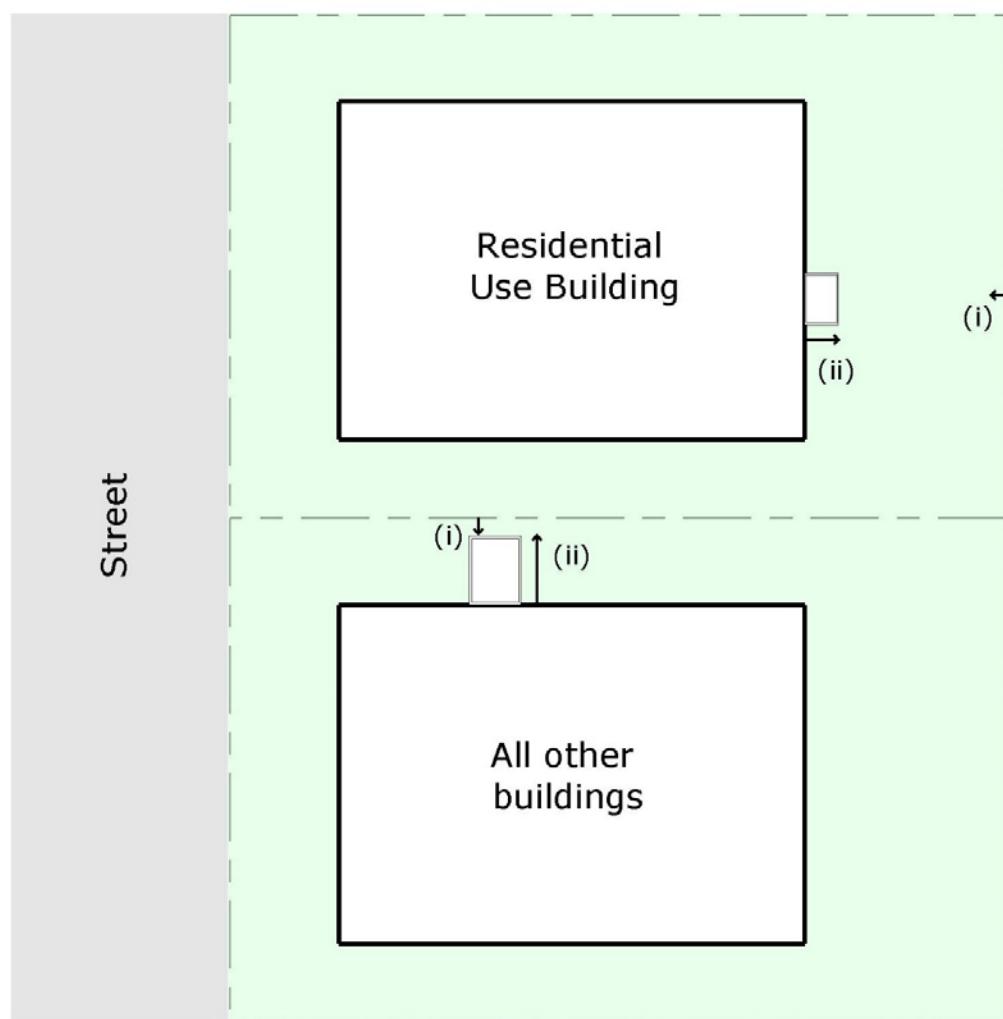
demonstrates the minimum setbacks and maximum projections for eaves, eavestroughs and gutters. The minimum setback and maximum projection for residential use buildings as described in 204-10(a) is shown in the top image and the minimum setback and maximum projection for all other buildings as described in 204-10(b) is shown in the bottom image.
